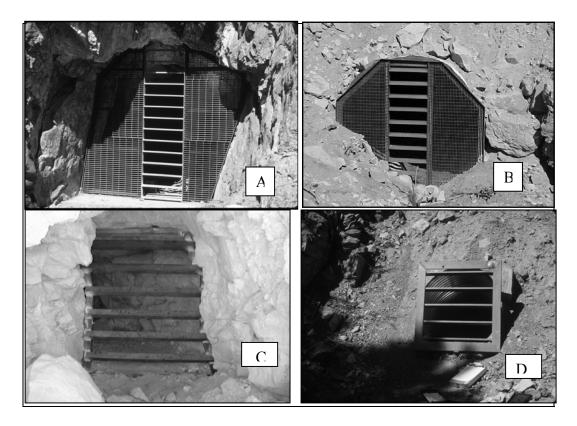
Styles of gate used at mines in Colorado. A) ladder, B) culvert with ladder, C) full, and D) culvert with full.
